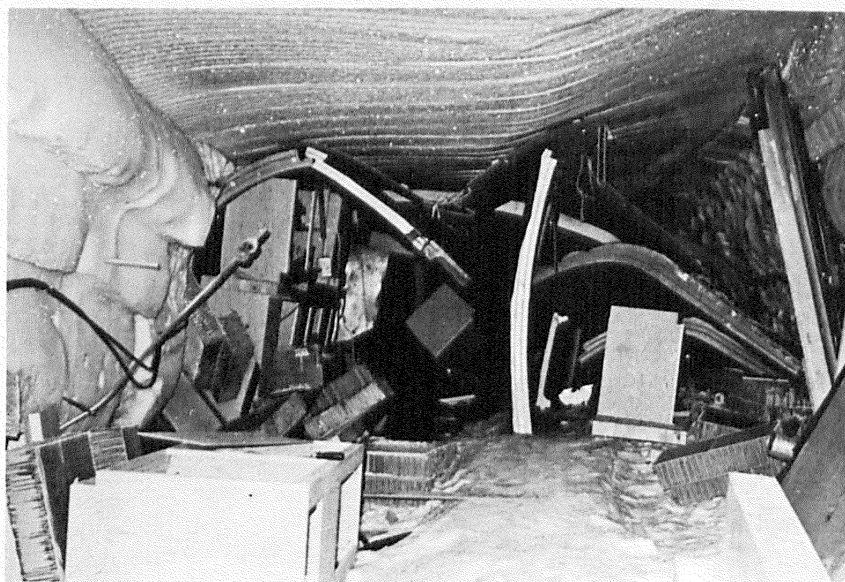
Jamesway Lab. Note effect of trench floor arching on Jamesway floor panels.
